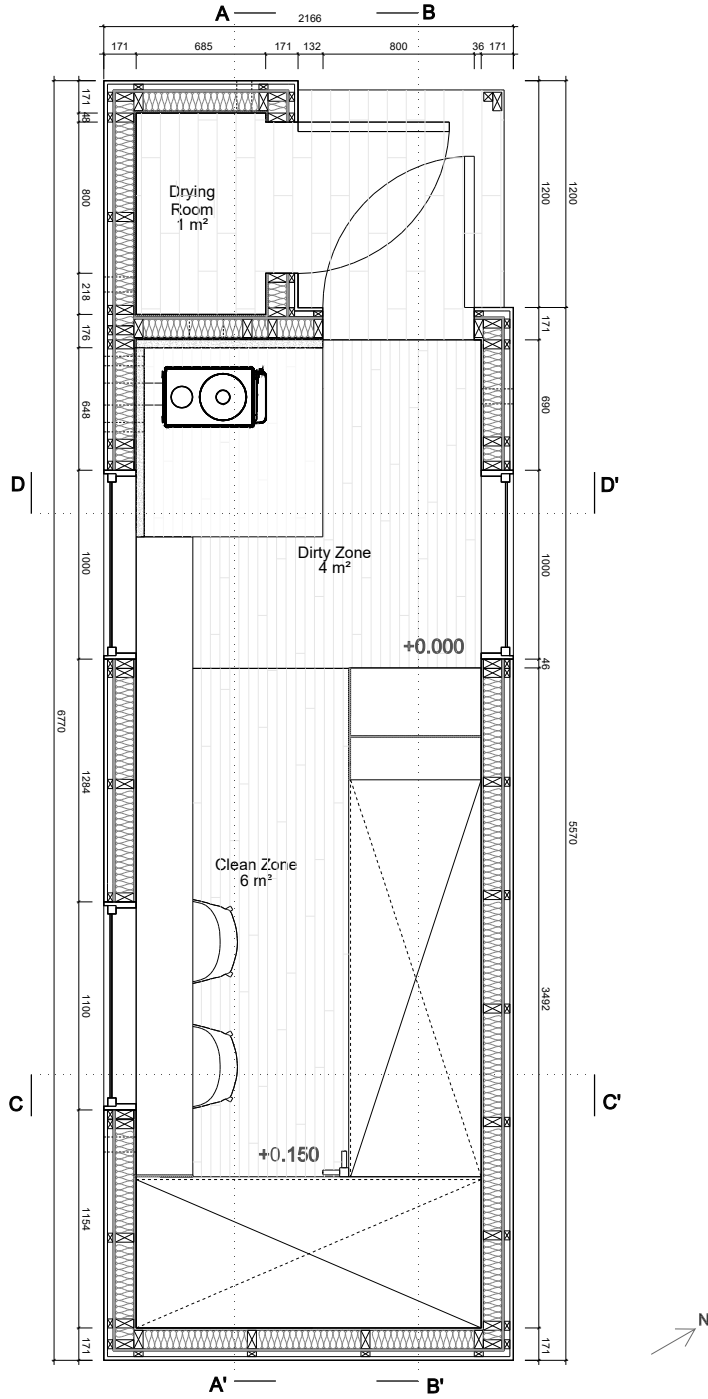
PLAN OF THE BUILT CABIN. SCALE 1:40
